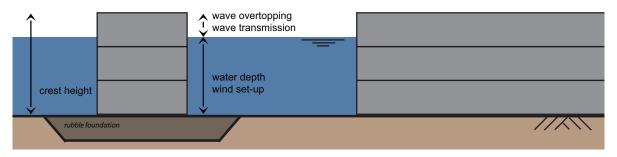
Cross-sectional View (left) and Side View (right) of Block Wall Breakwater
